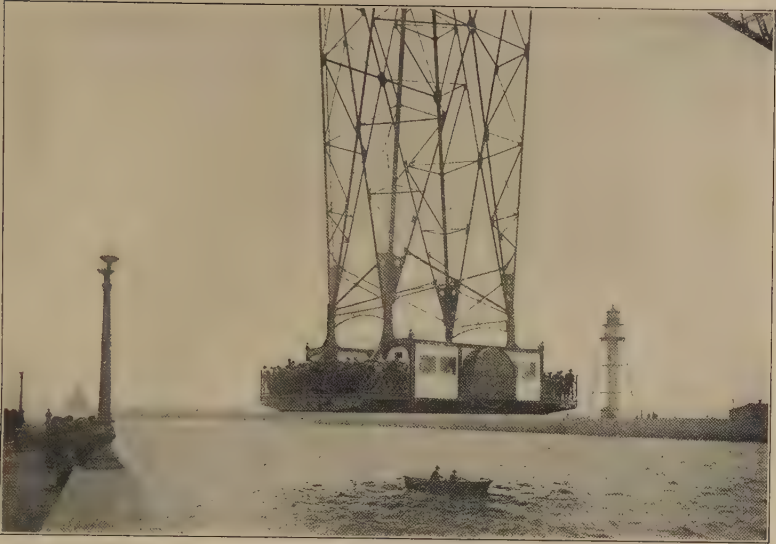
CAR AND TRAVELER, DULUTH FERRY BRIDGE.
